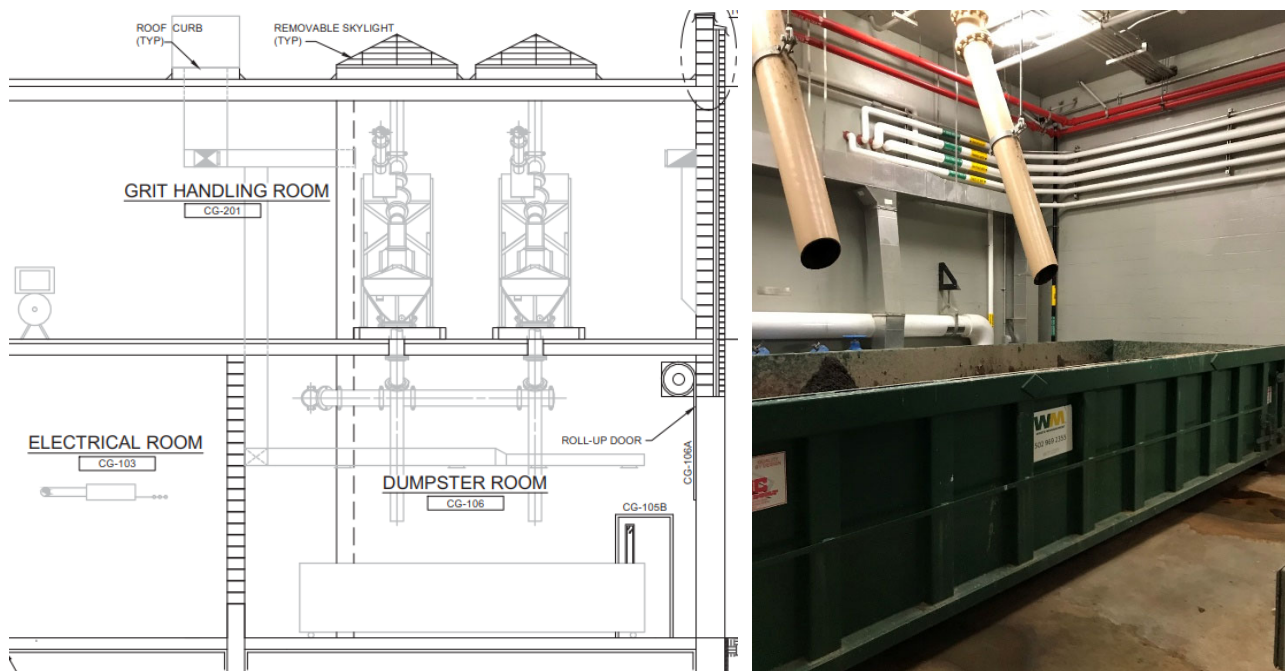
Pump Station 1 Dumpster Room Section View (L) and Site Visit Photo (R)
